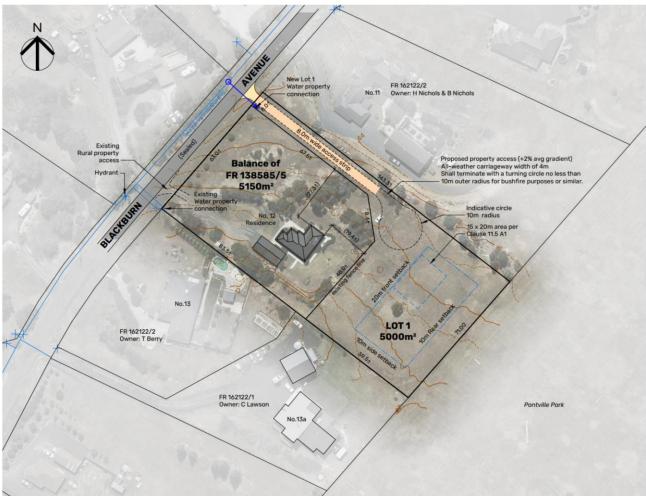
Proposed Plan of Subdivision - 51446CT-1B
